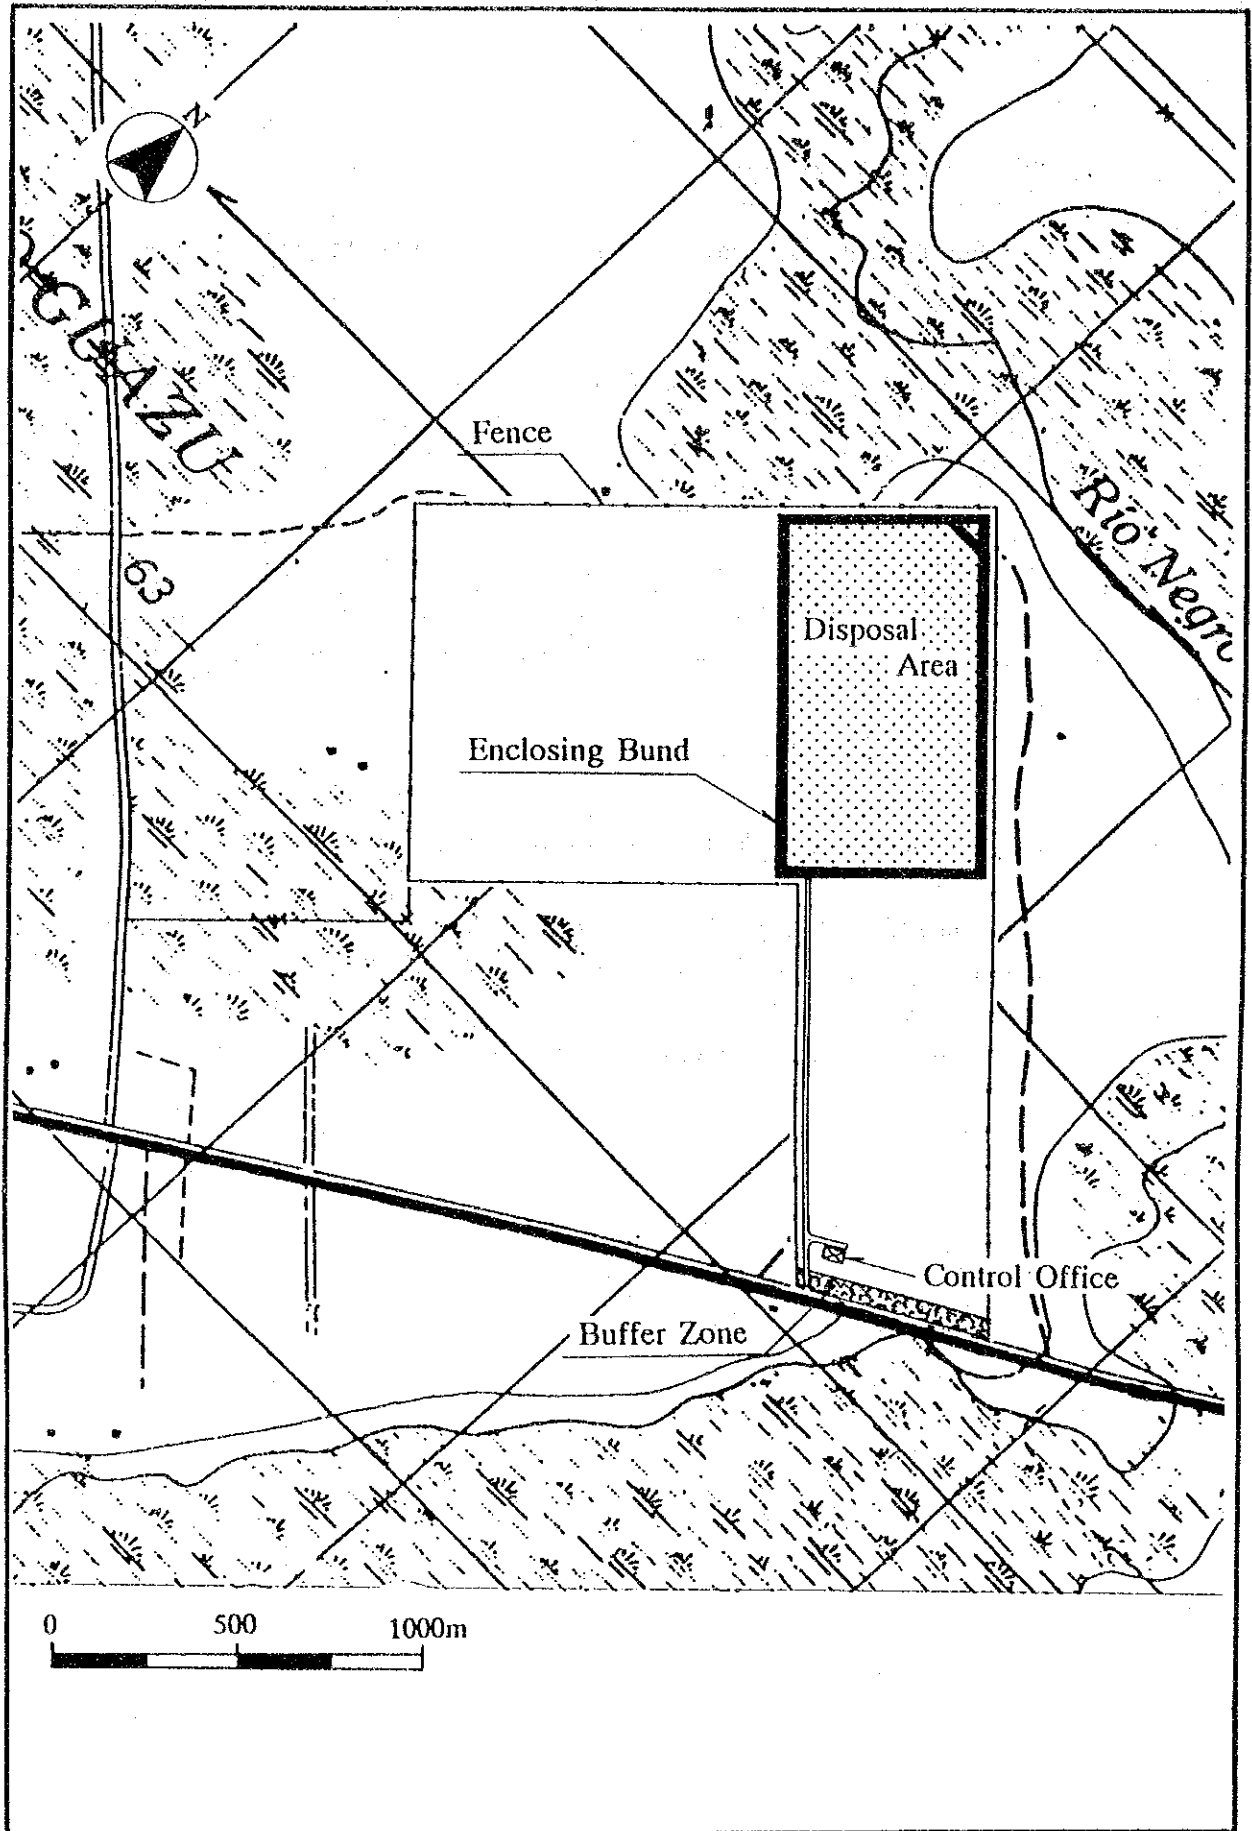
Arrangement of Sanitary Landfill in A-5 Site
